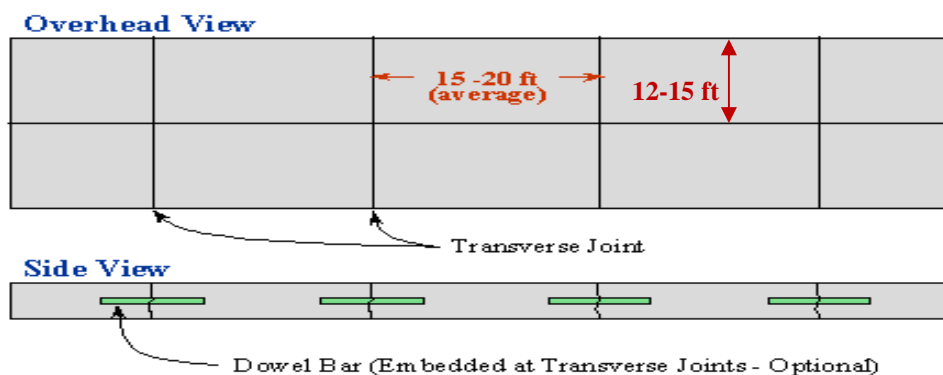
Jointed Plain Concrete Pavements (ACPA 2009)
